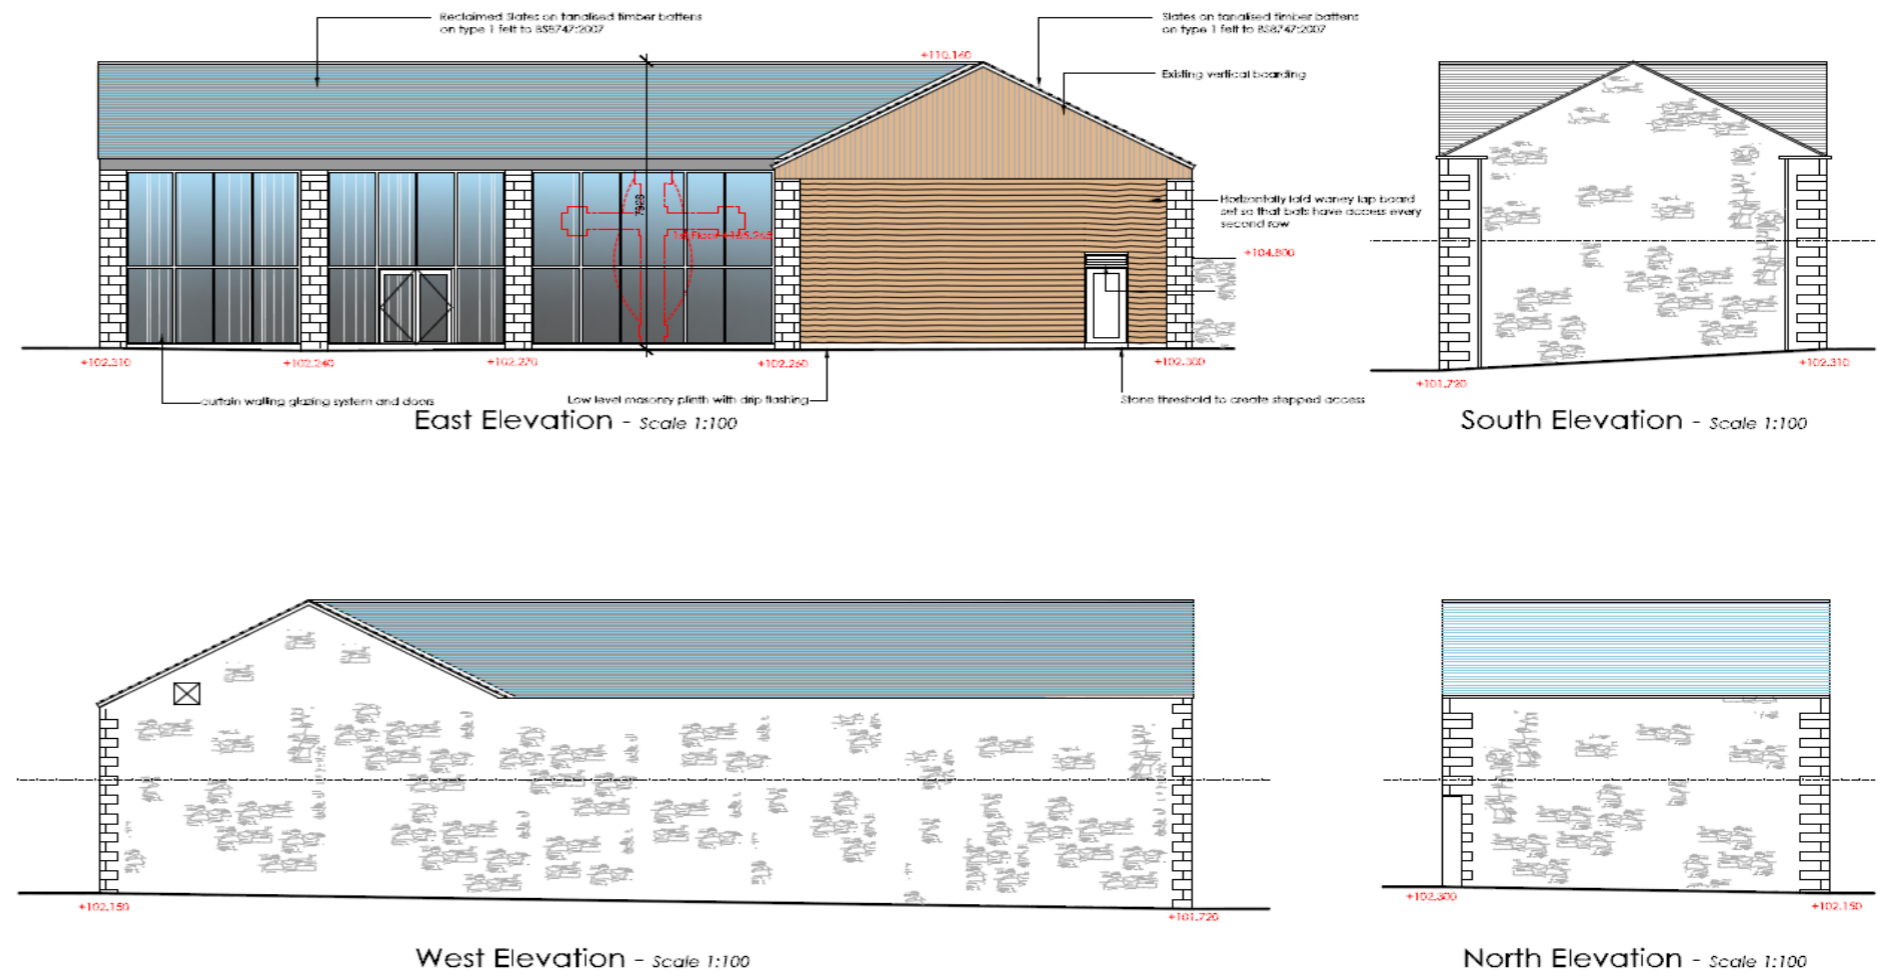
Proposed Elevations - dwg. no. 9311-L01
